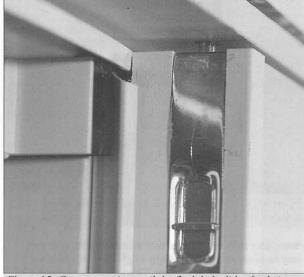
Correct sagging until the flush bolt slides freely into the pre-drilled hole in the head.
